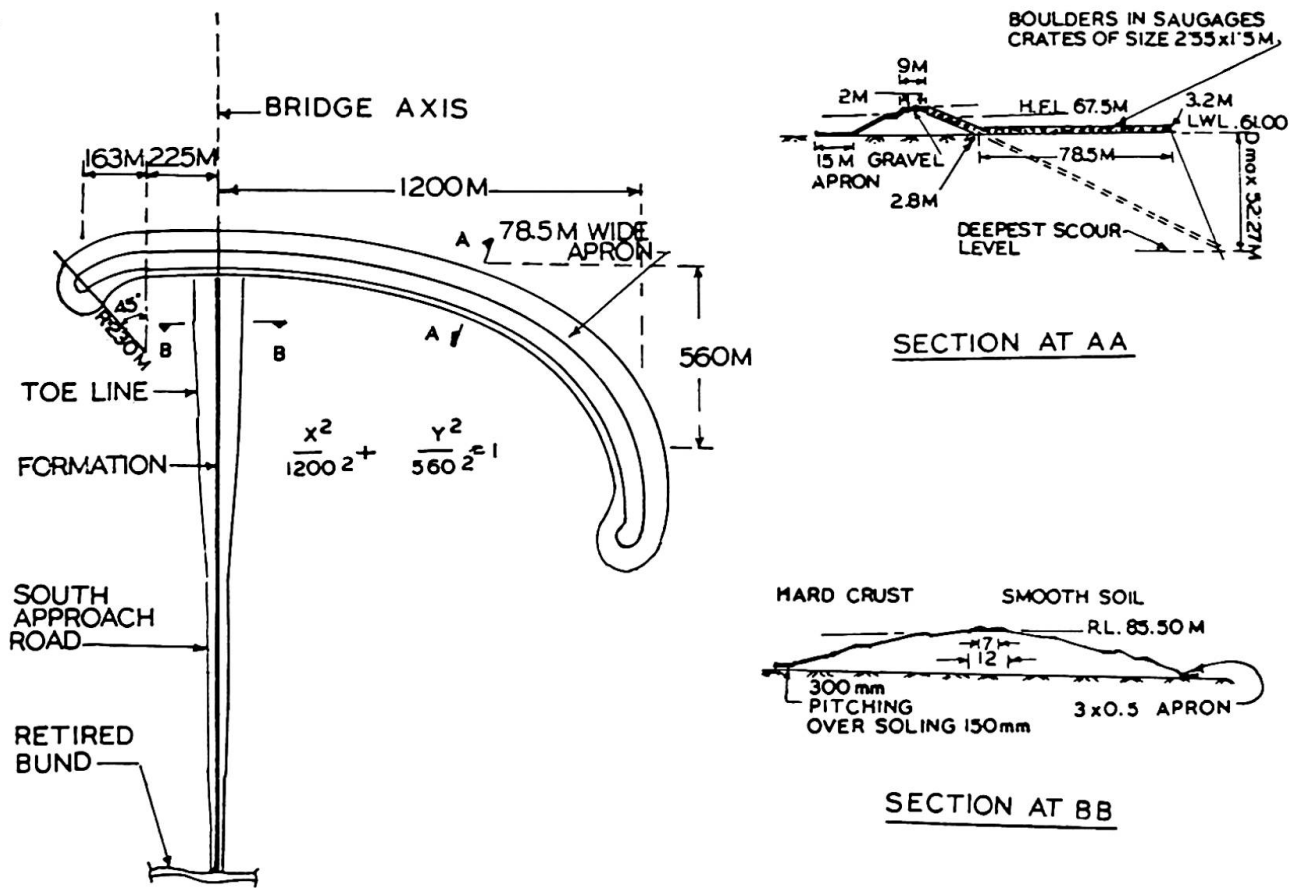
GUIDE BUND DETAILS OF TEZPUR BRIDGE.
